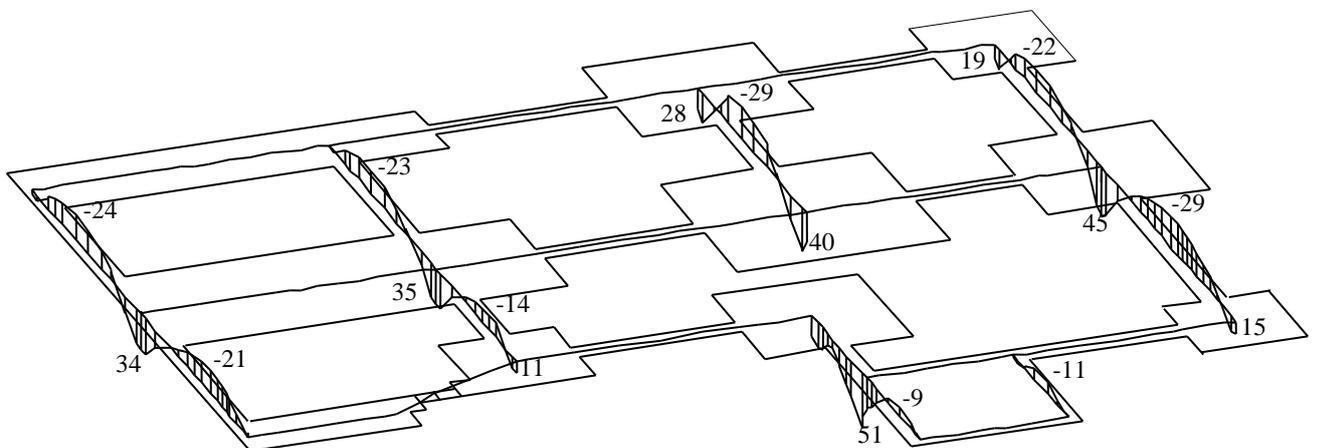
Moment M_b [kN.m] in girders at transversal direction
